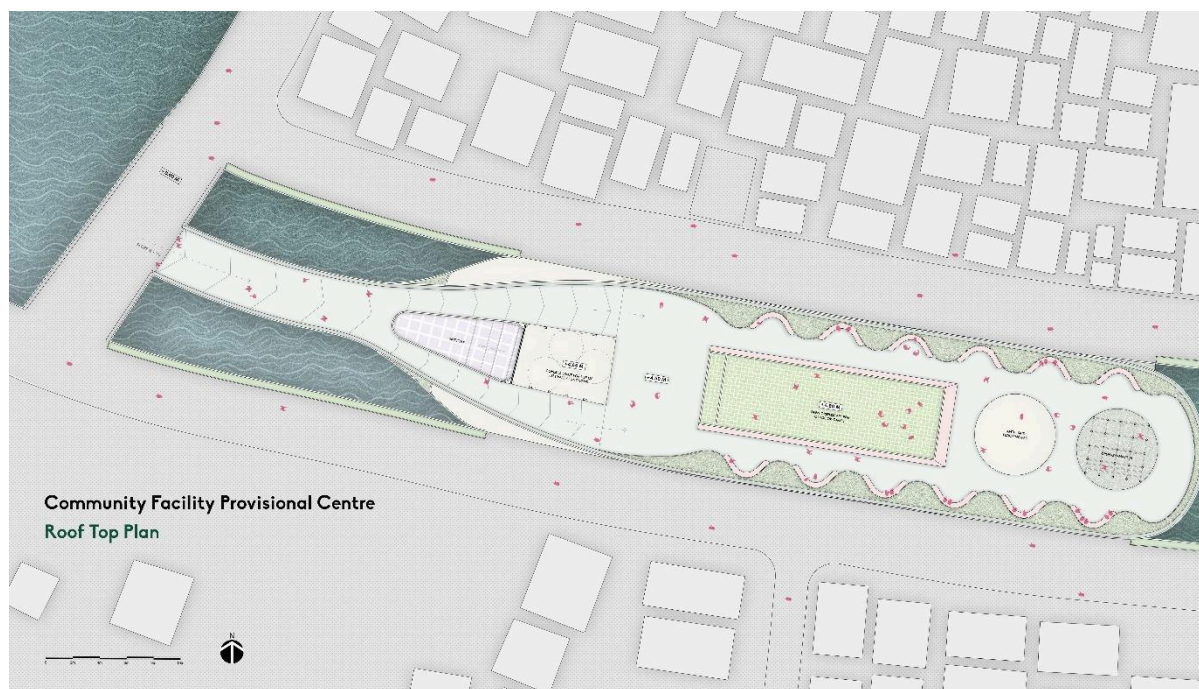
Community Facility Provisional Centre Roof Plan (Source: Author)
